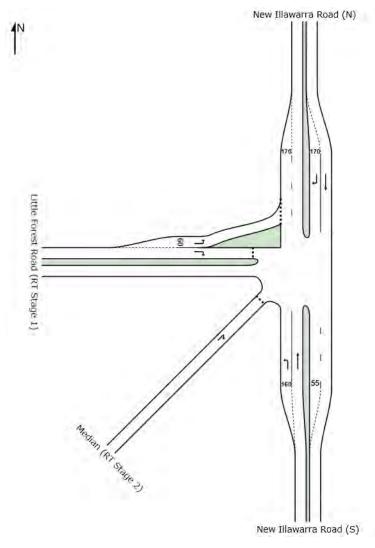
Existing Little Forest Road/New Illawarra Road intersection layout
